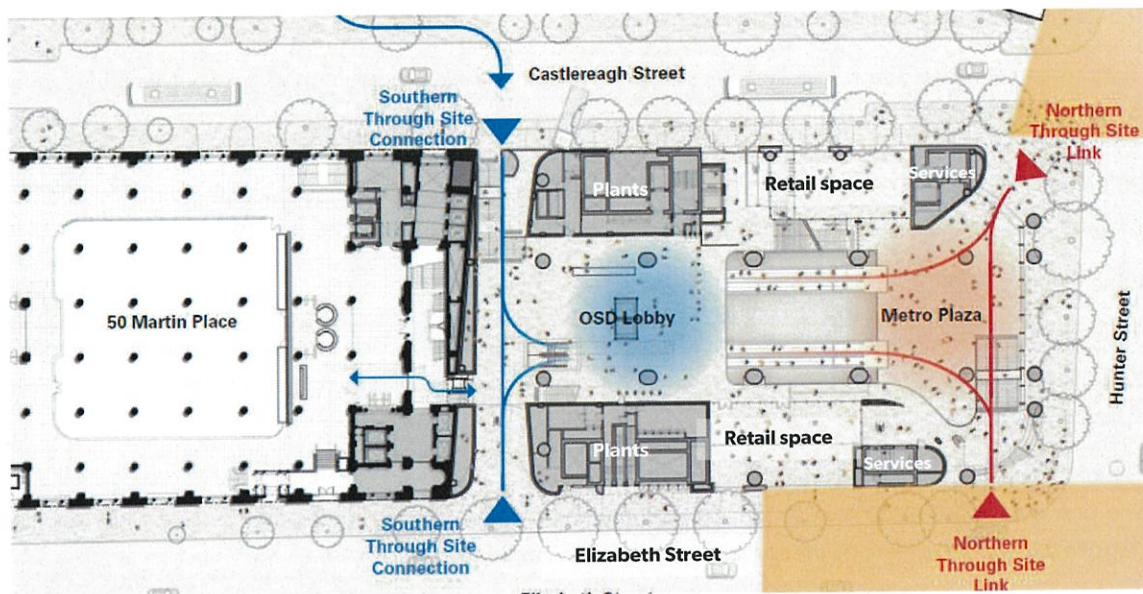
| Floor plan showing ground floor circulation, including proposed east-west through-site link. Plant and services are coloured grey (Source: Applicant's RtS)
